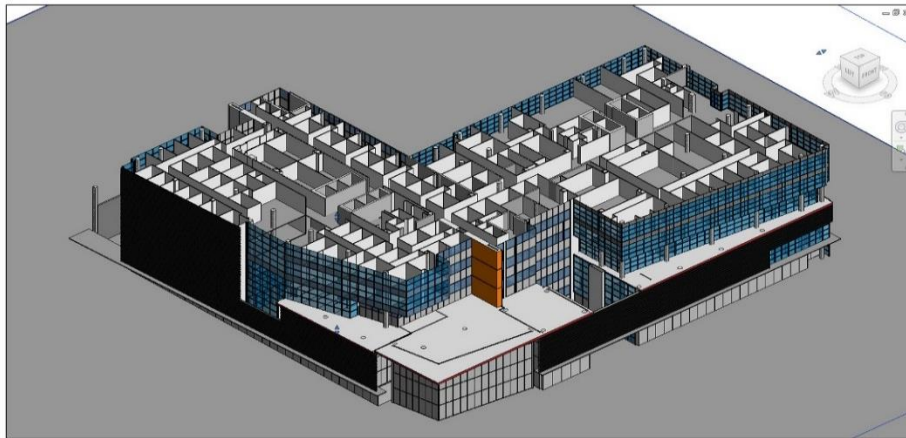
The EV BIM Model Façade, Plan Details and Floor Heights
